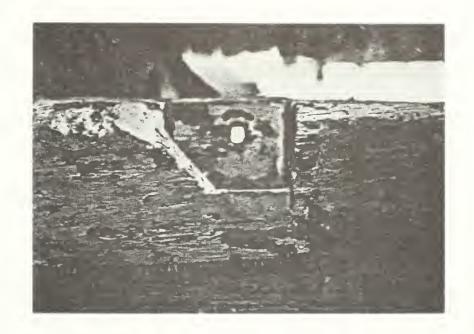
West India Goods Store, interior of second story, west wall looking north, post between bays A and B, showing cut made to accept possible partition framing.
